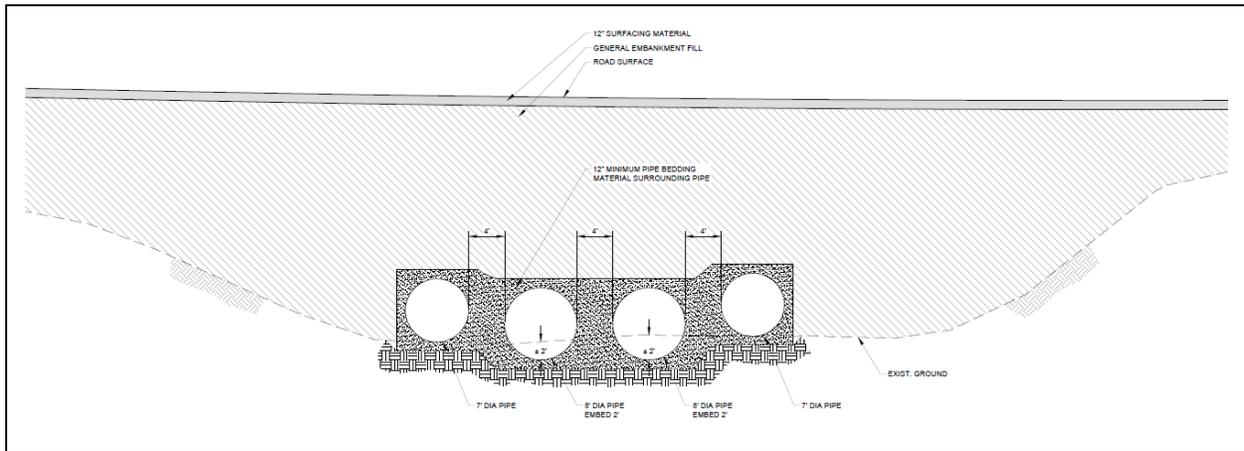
West Fork Ikalukrok Creek Culvert Crossing
